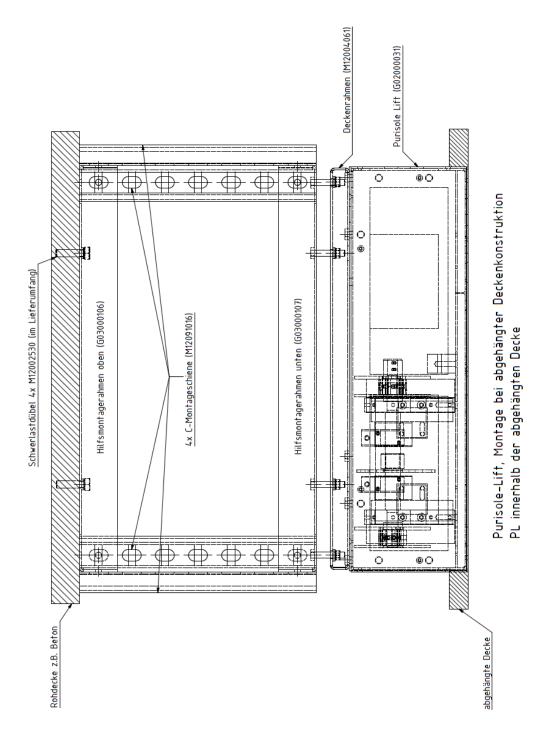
Purisole Lift, installation with hung ceiling structure, PL inside of hung ceiling
